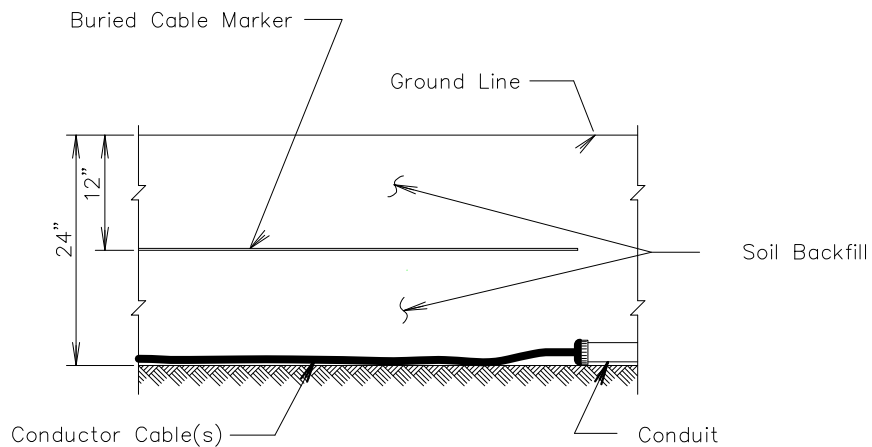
LIGHTING-CONDUCTOR CABLES-CONDUIT
